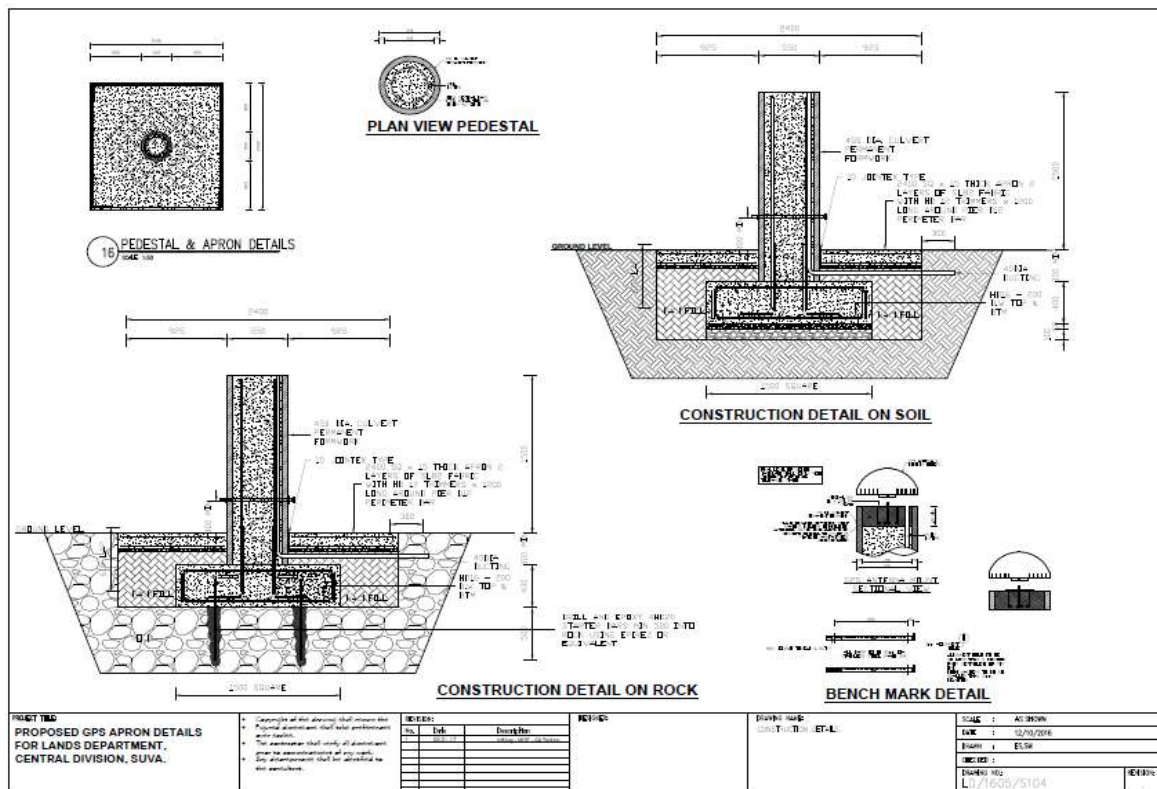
Design layout plan for the GNSS CORS Pillar at the sites; Note that 350mm diameter culvert used for formwork and not as per above drawing
